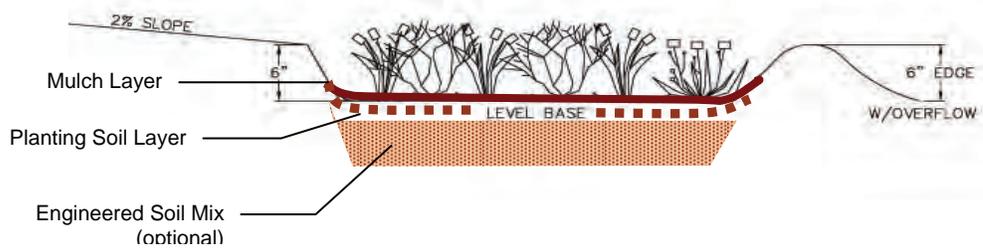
Rain Garden Layout for Parking Lot Runoff
